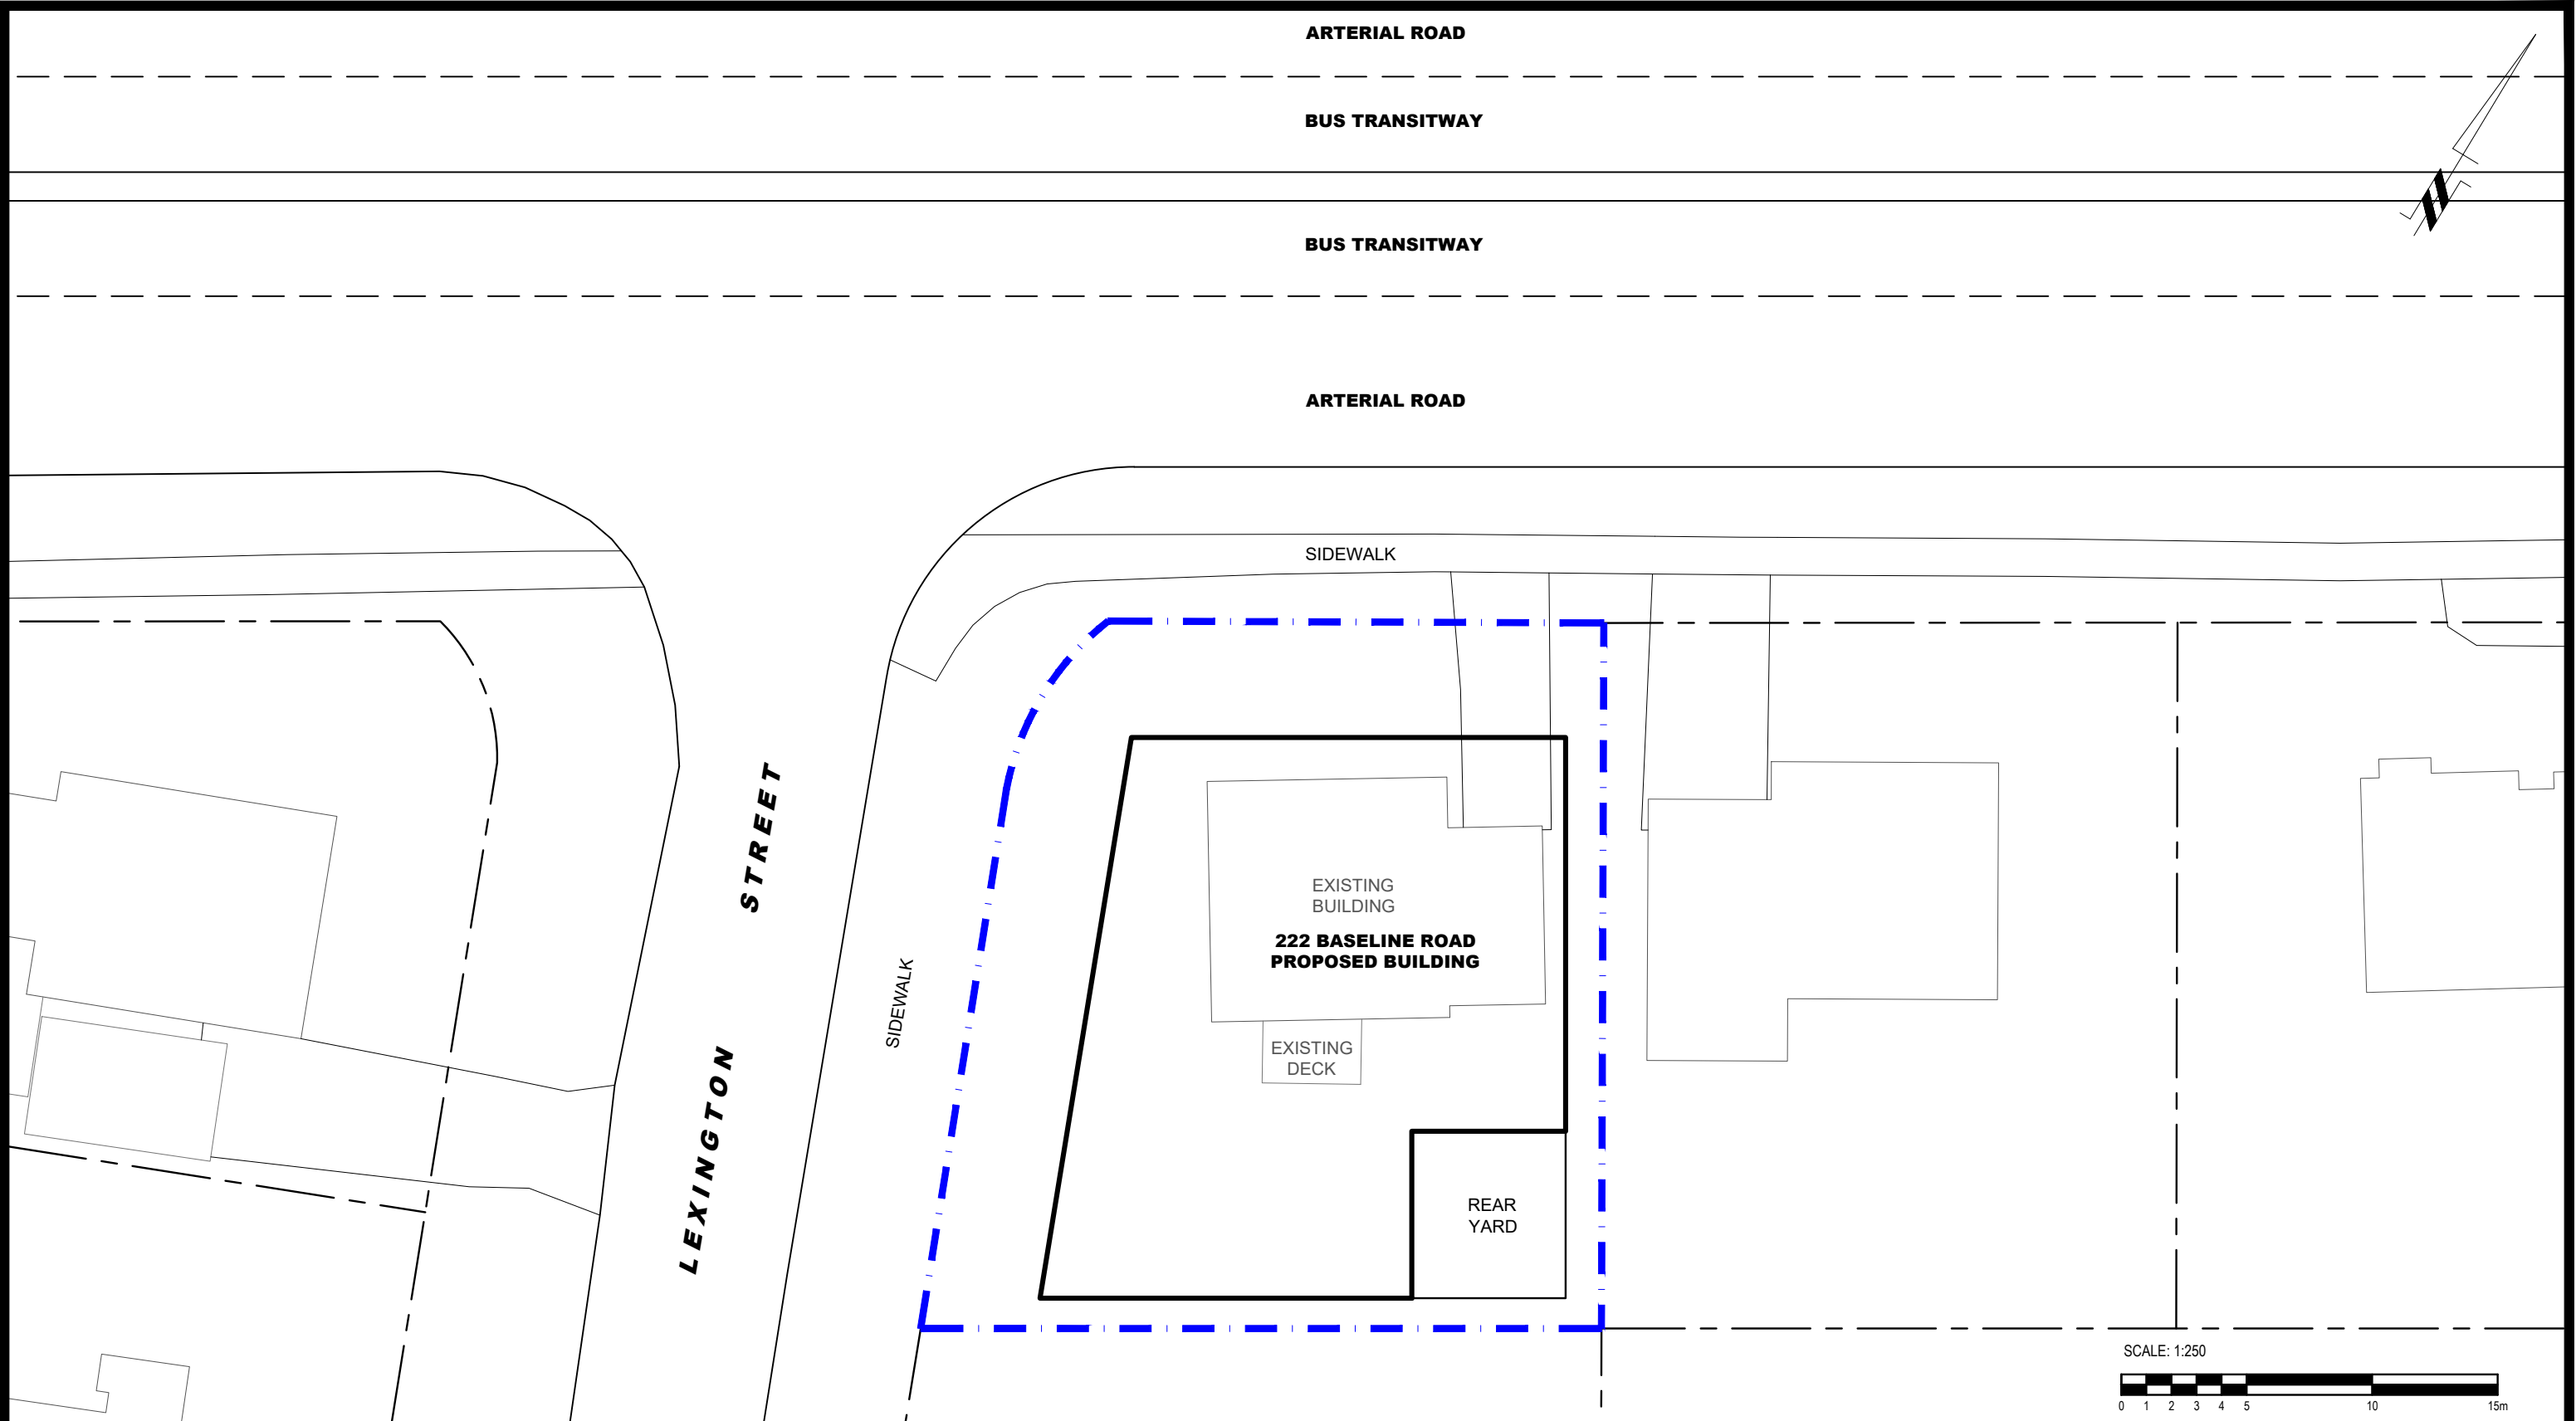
C - Site Geometry (REC 3-1 and REC 3-3)
